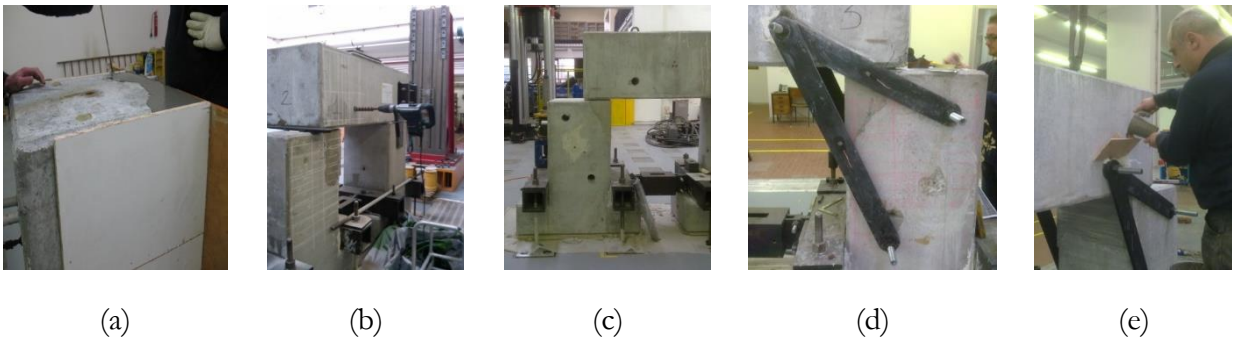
Installation phases: (a) restoration of the damaged concrete; (b) reported location of the reinforcement bars; (c) anchorage holes; (d) installation of steel profiles and dowels; (e) cast in situ of high strength grout
